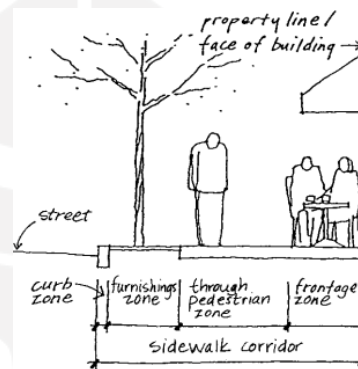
Typical section of pavement in commercial areas Source: Portland Pedestrian Design Guide (1998)
